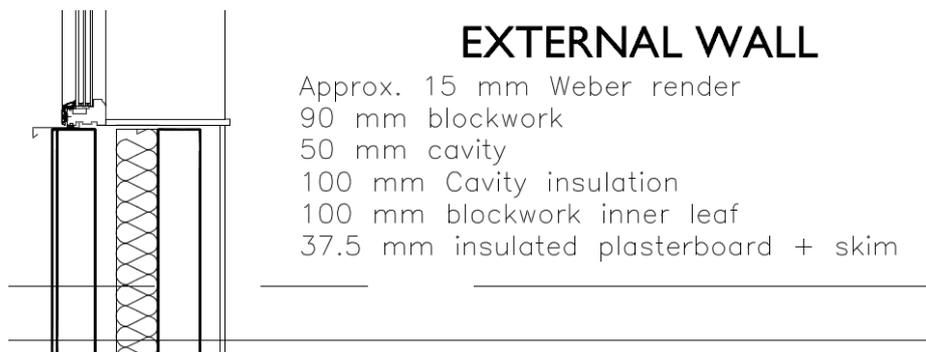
Phase 2 – First Floor Cross Section of Masonry Wall
